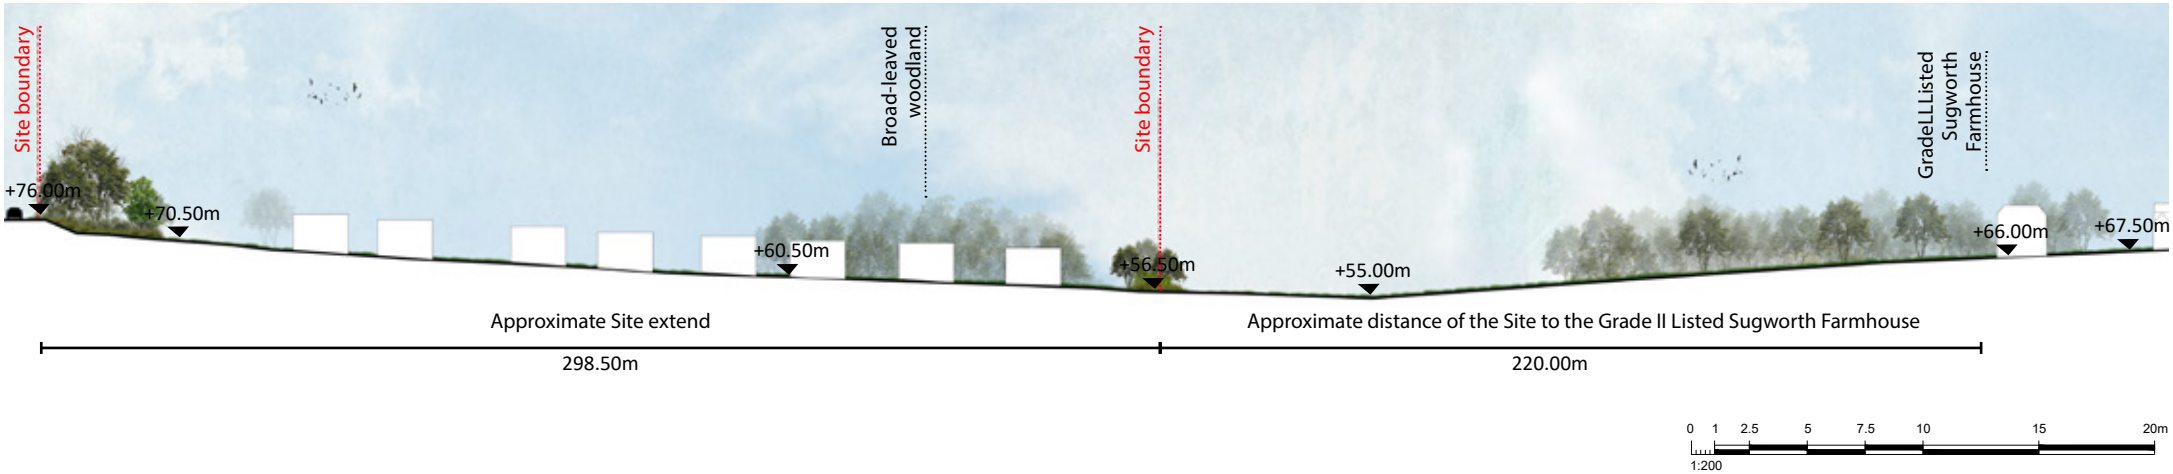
TYPICAL ILLUSTRATIVE SECTION BB' OF THE PROPOSED LANDFORM
